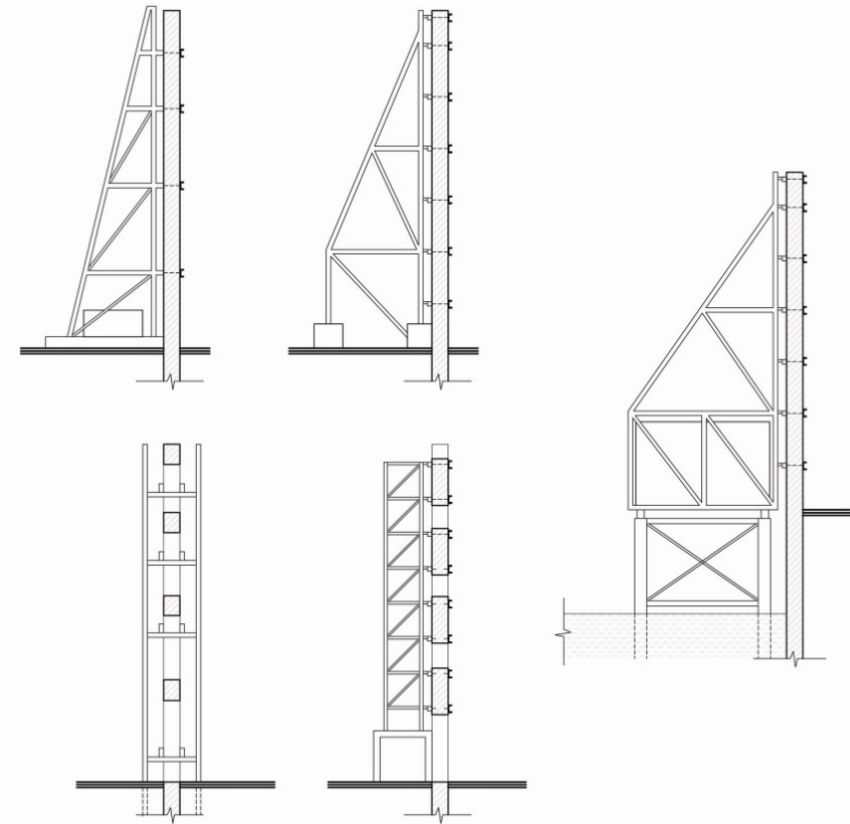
Exemplary constructions of the steel stabilization systems [4]
